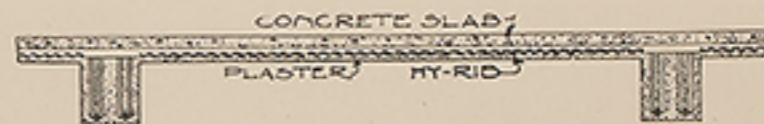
Hy-Rib Floors with Reinforced Concrete Beams.
